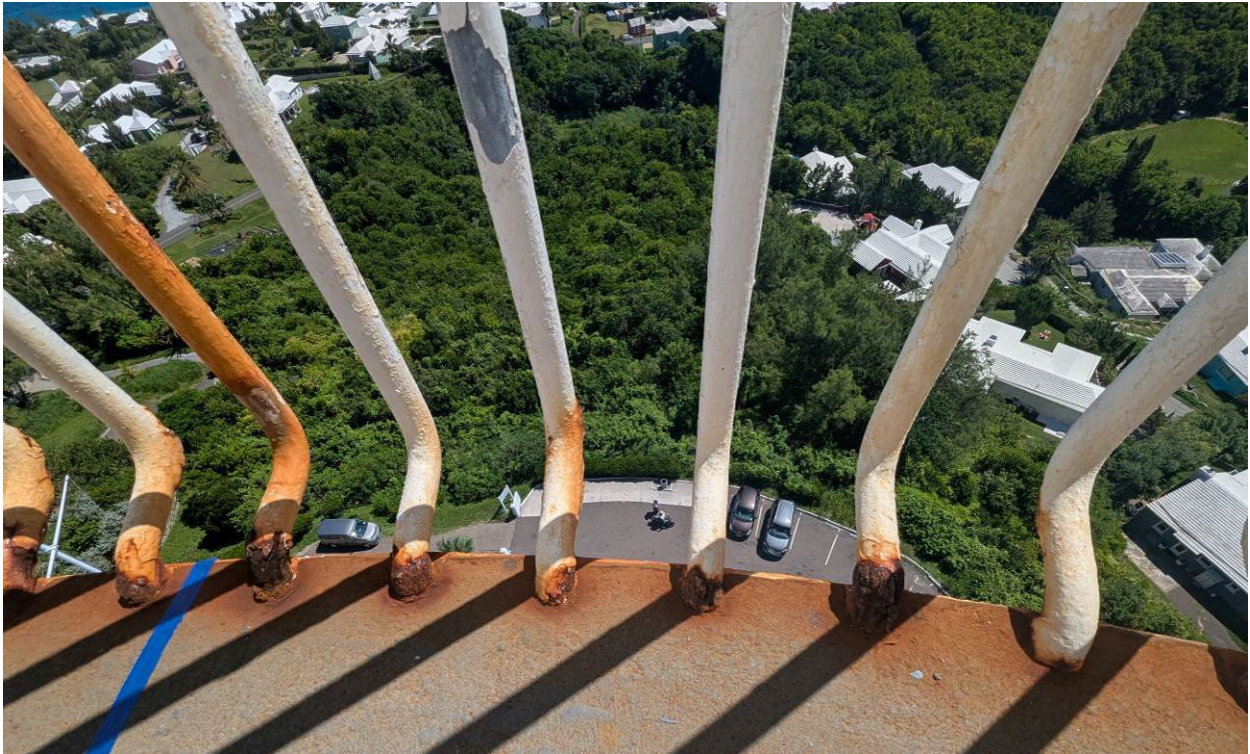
Example of bolted connection at underside of platform and corroded bars (Section 6)
